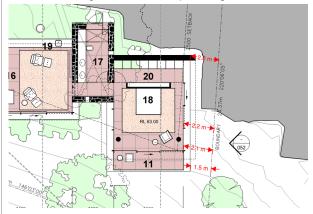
Proposed setback projections on north boundary level 2 (Source: HSA)
